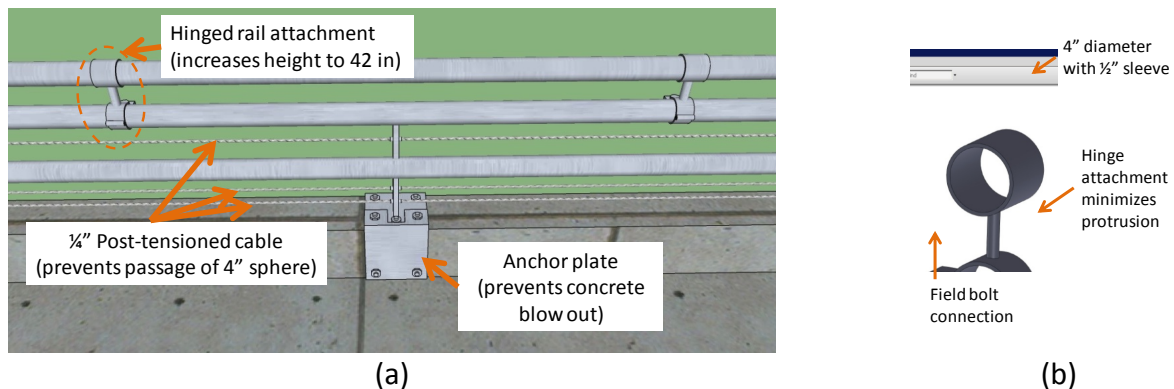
Recommended design option for rail attachment on Section 2 (vehicle barrier): (a) schematic representation with added safety features and (b) hinged rail attachment connection
